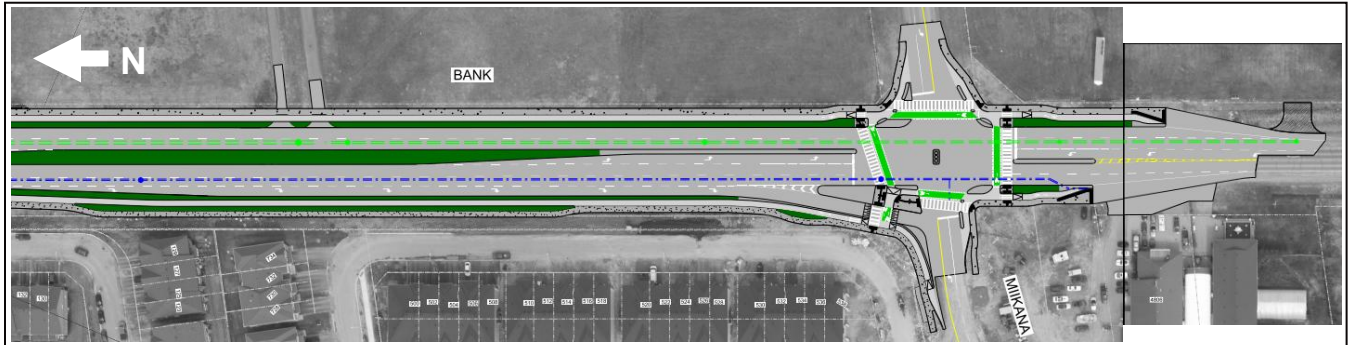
Future Bank Street & Miikana Road/Blais Road Intersection
